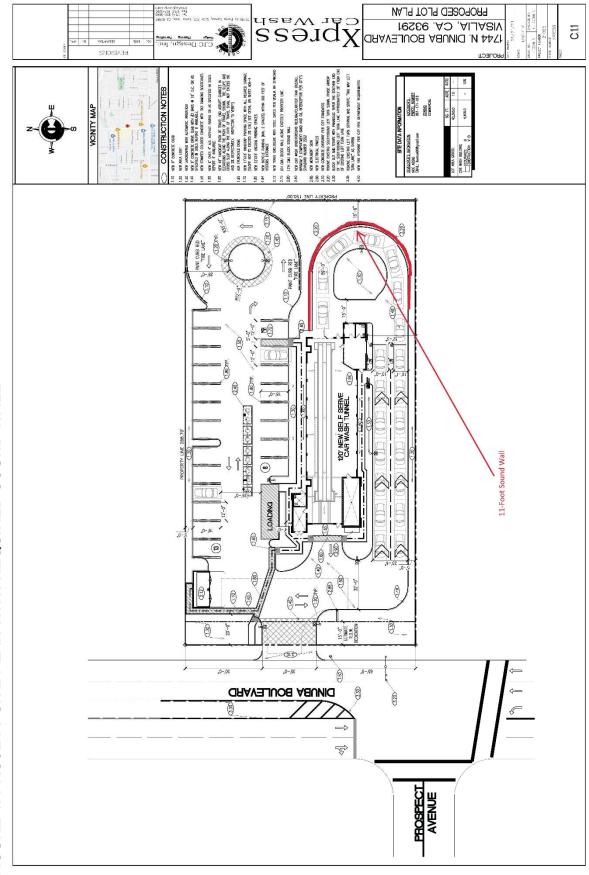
PROJECT SITE PLAN WITH REQUIRED SOUND WALL
